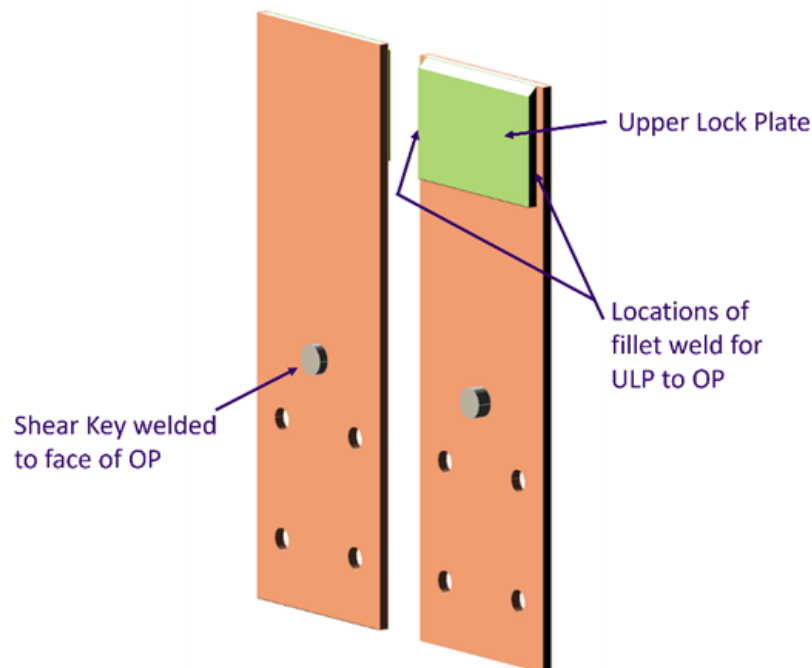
OP* assembly with the *ULP* welded to the interior face and the *SK* welded to the exterior face of the *OP*.
